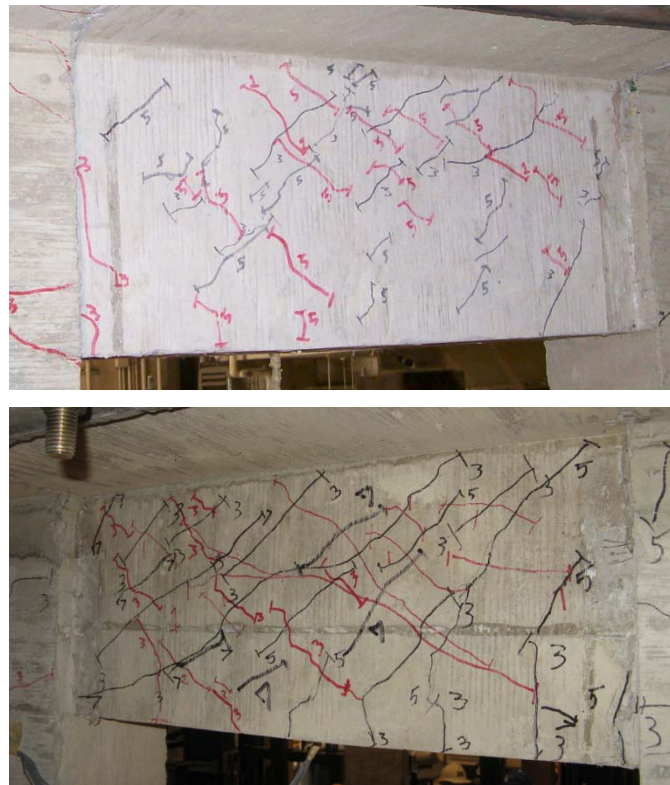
Damage state of coupling beams at a system drift of 0.75%. HPFRC and reinforced concrete coupling beams are shown top and bottom, respectively.
